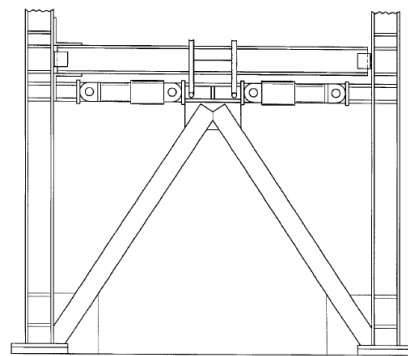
The construction detailing of a typical chevron bracing system with two FVDs (Constantinou 2002)
